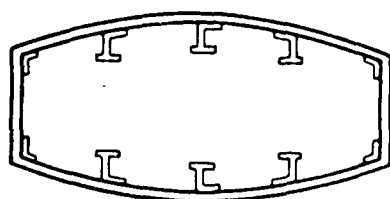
Structural Behavior Typical of Built-Up Beams (Ref. 44)
